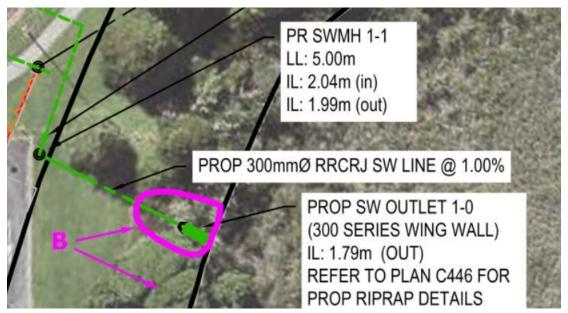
proposed Stormwater Outlet 1 placed over aerial image of the site by PBM. Tree Group B is the combination of trees surrounding the outlet and pipe near the coastal edge
